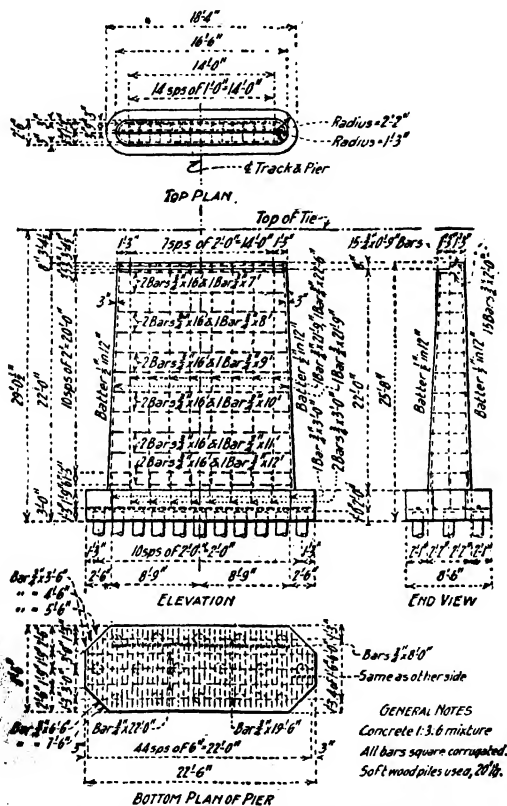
Trestle pier of C. B. & Q. R. R.
